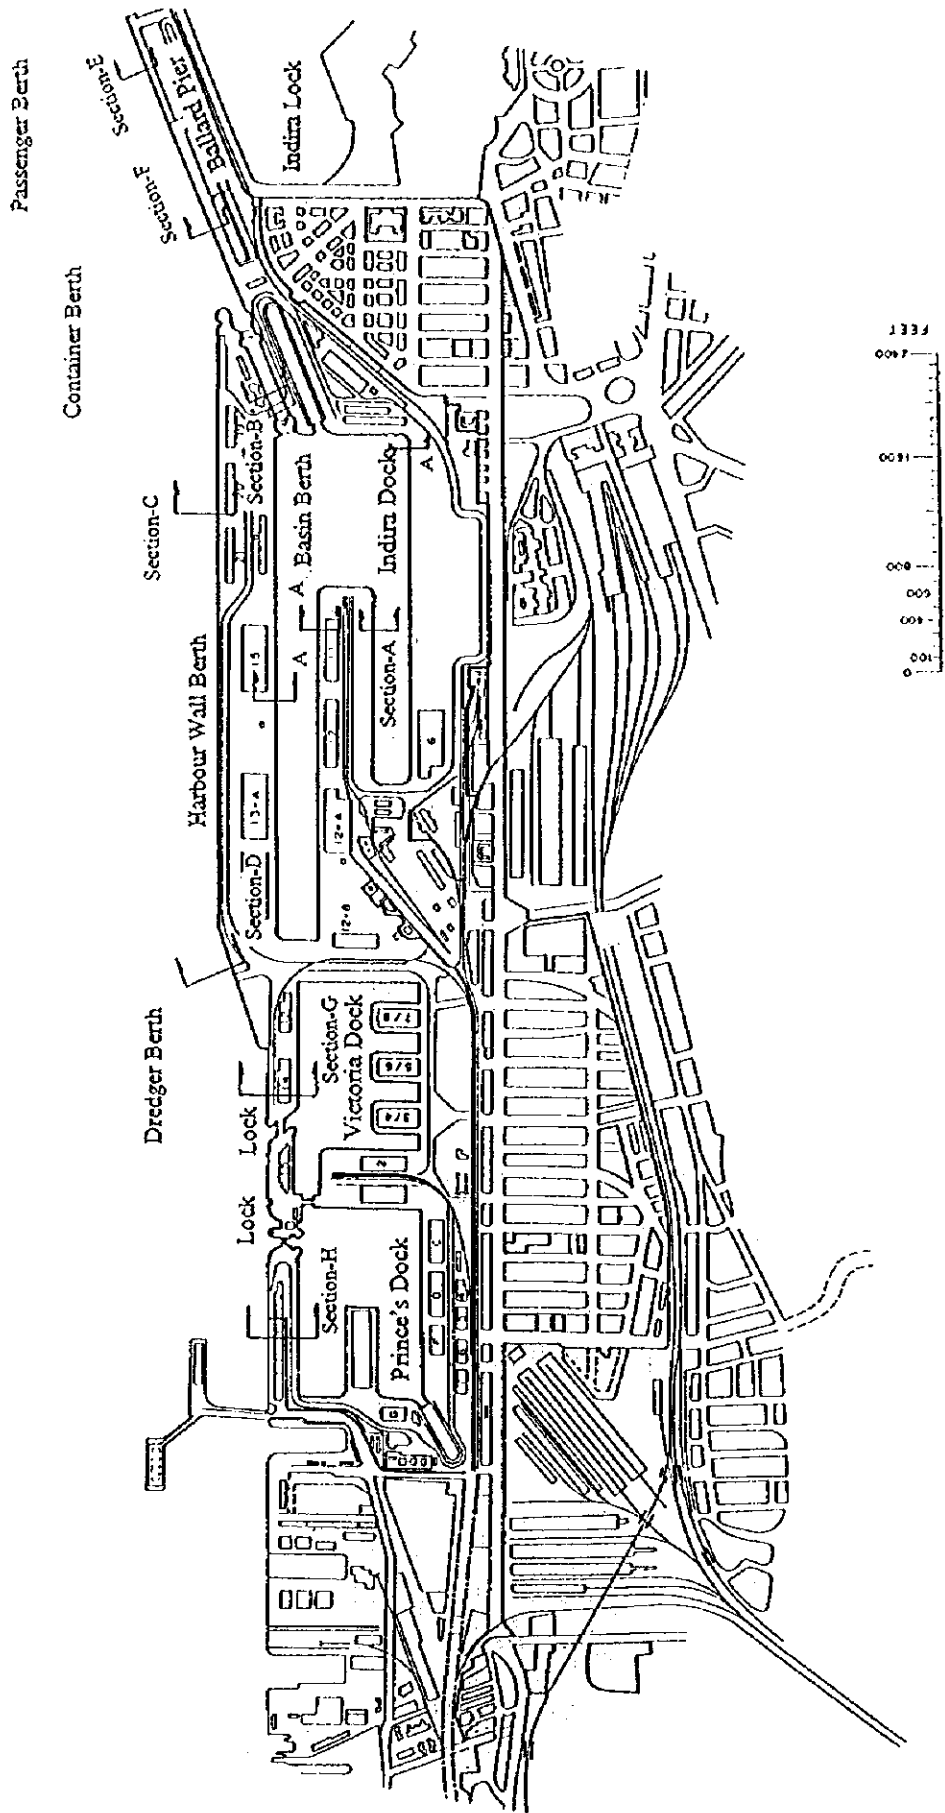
Plan of Dock Area in Central Mumbai Port
